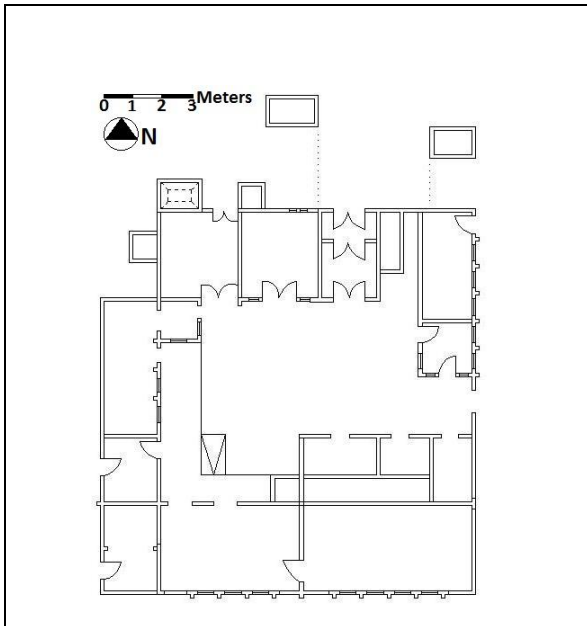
Schematic Ground Floor Original Plan of Zeyko Factory, Kyrenia
